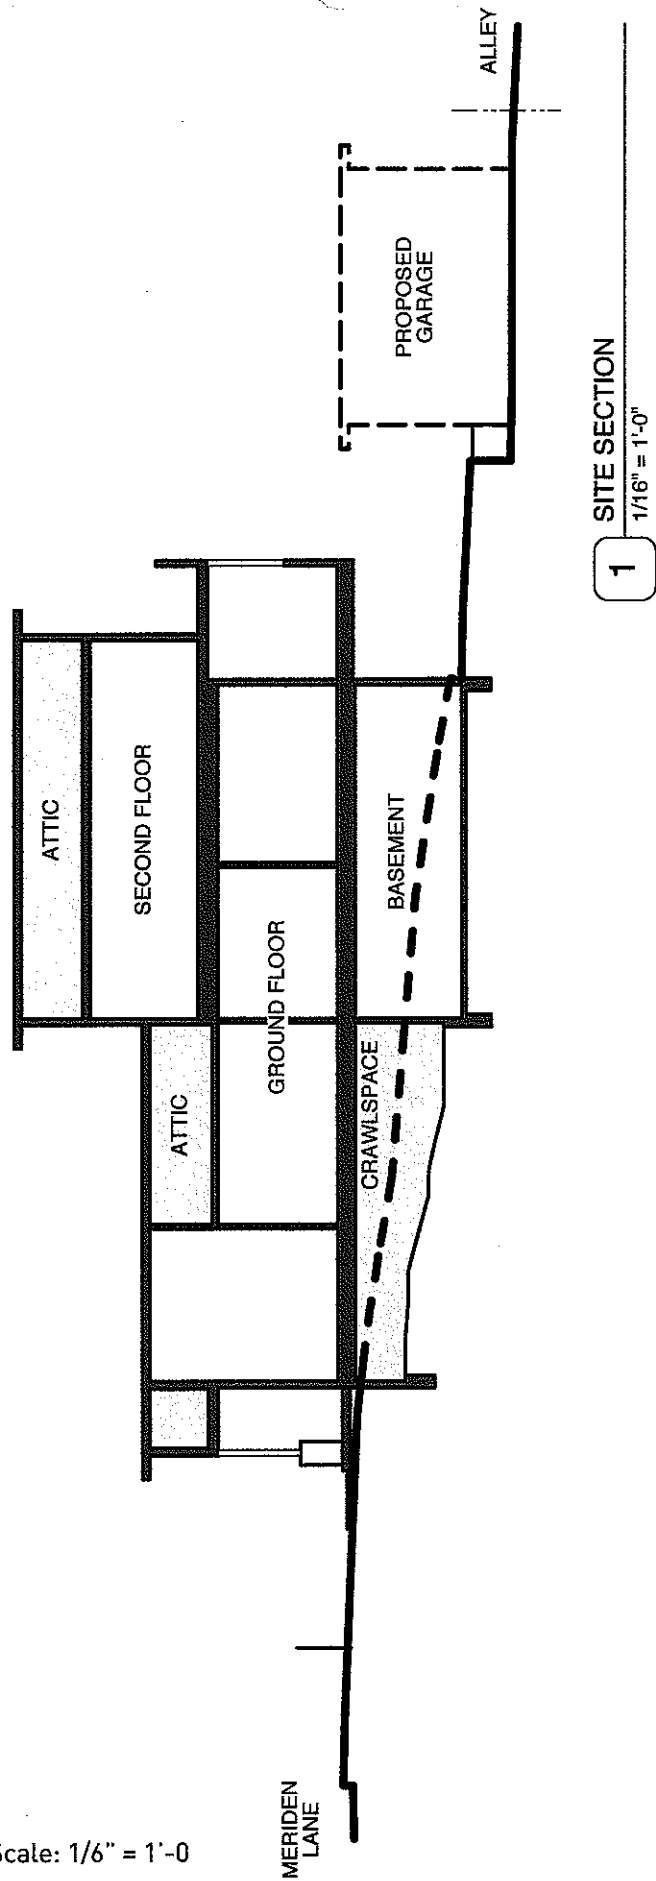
Proposed site section. Scale: 1/6" = 1'-0
